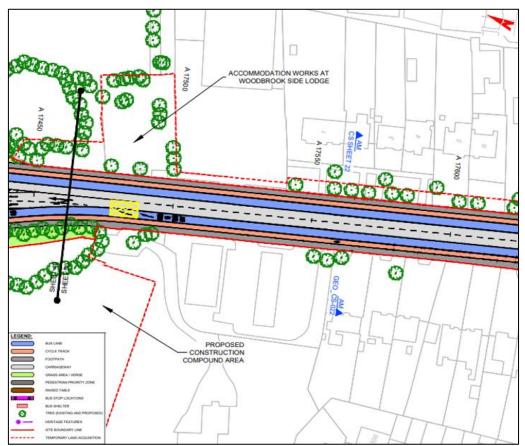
Extract from General Arrangement Drawings at Windsor Motors Bray (Sheets 50)
